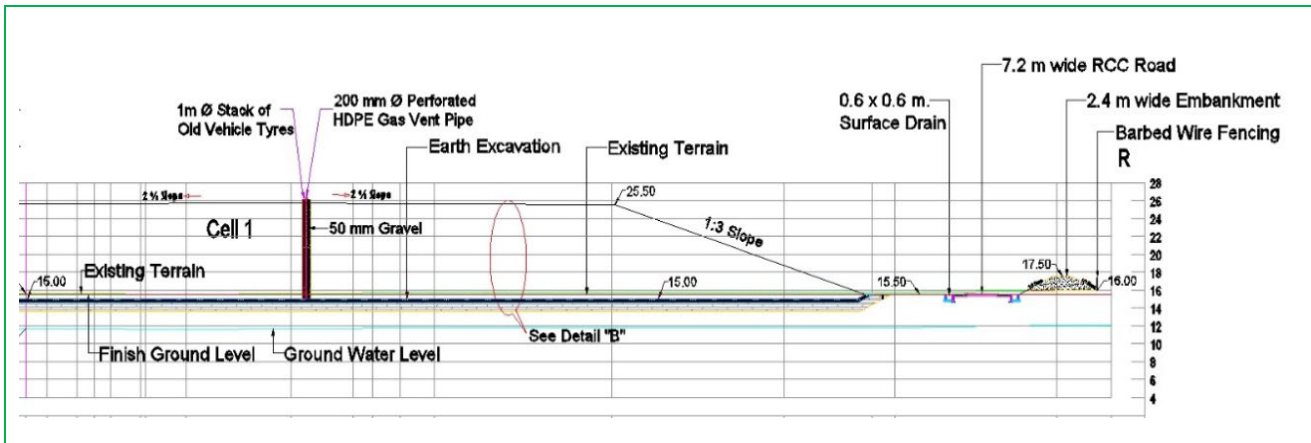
Typical section of landfill cell shows the height of the cell, slope, leachate collection system and landfill gas vent pipes etc.
